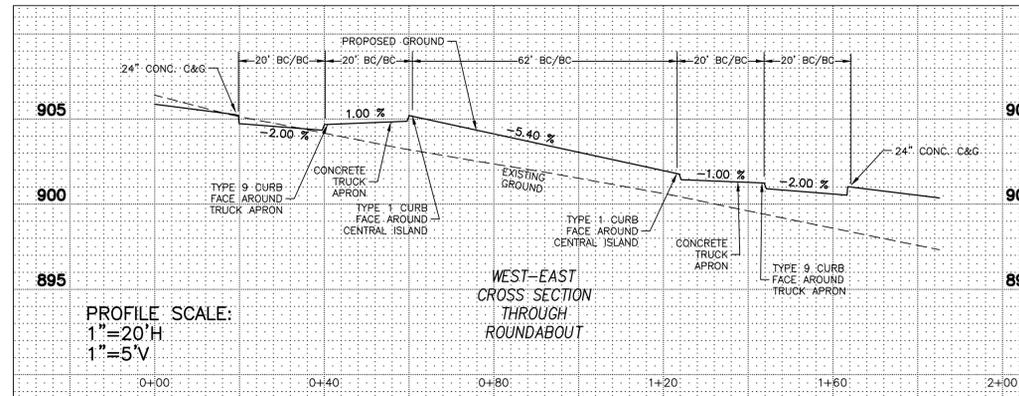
B. Roundabout Detailed Section & Truck Apron Detail
